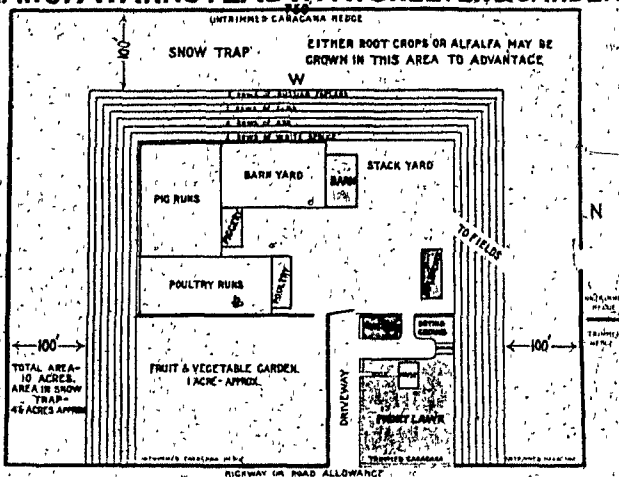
A PRACTICABLE FARMSTEAD PLAN
